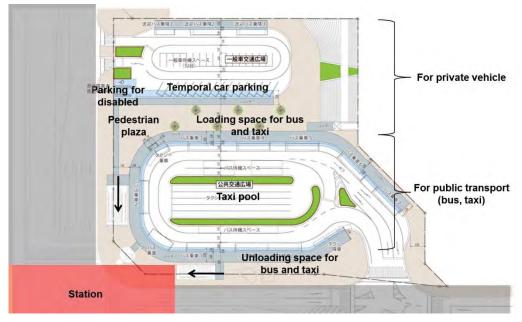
Example of Facility Layout Plan of Station Plaza
